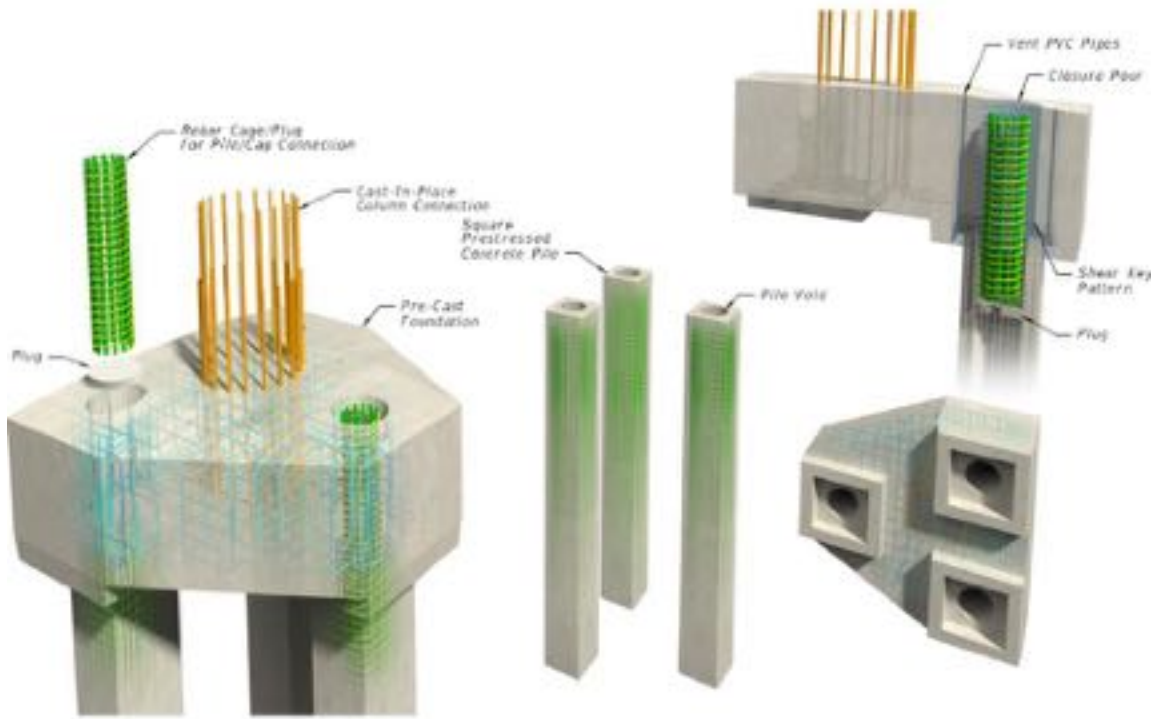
Sample detail for precast footings provided in FDOT Structures Detailing Manual
